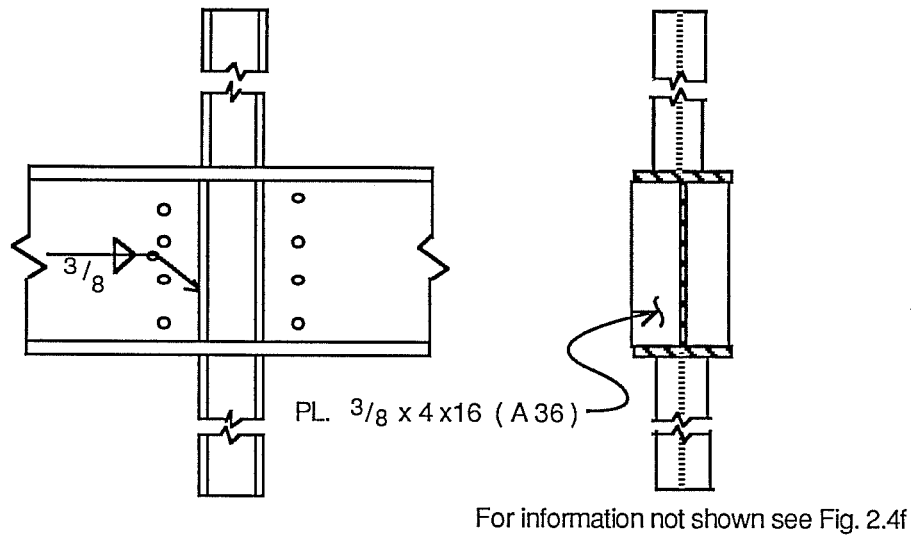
Specimen 14: Web Stiffener Plates and Column
